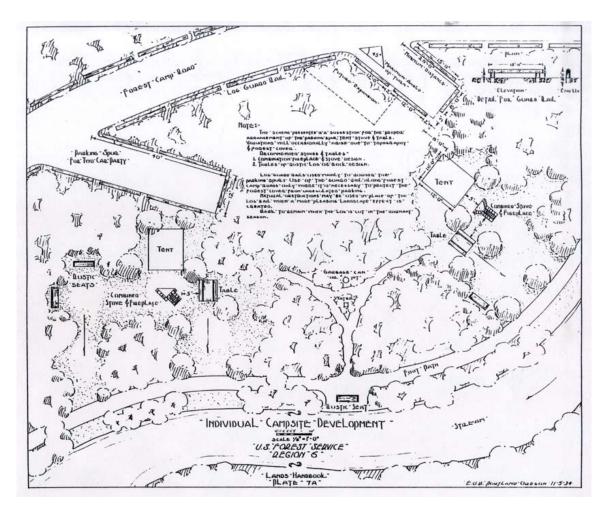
Suggested campsite layout from the 1930s U.S. Forest Service Recreation Plans Handbook, 1935.
